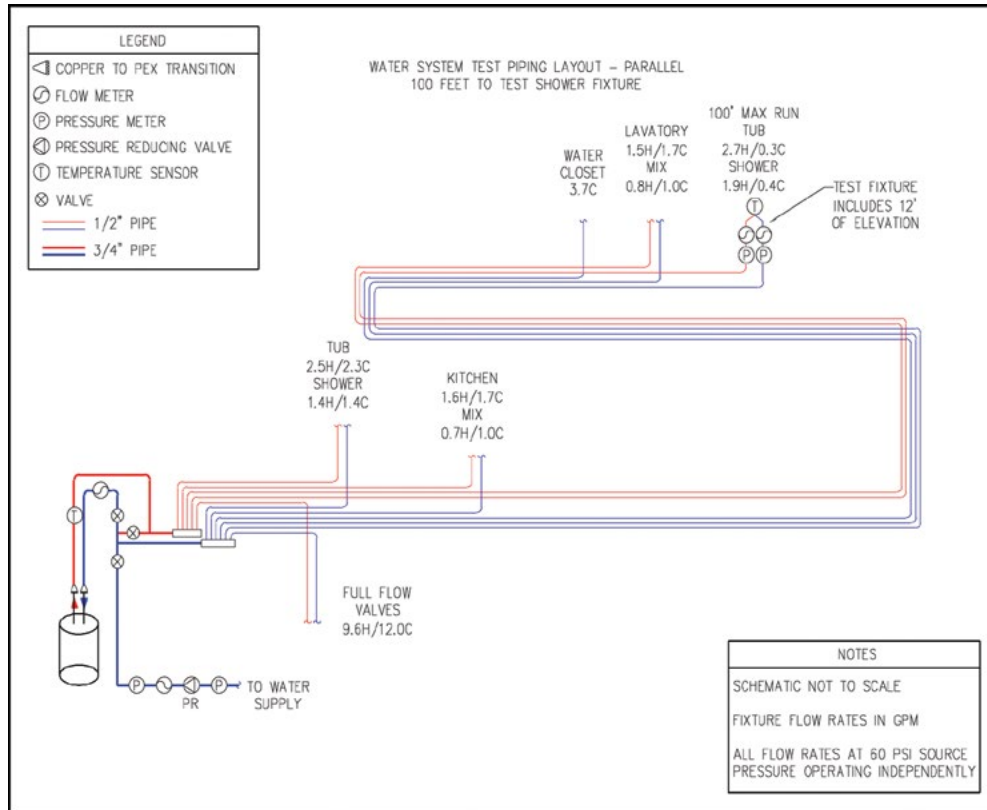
Water System Test Piping Layout – Parallel, 100' to TF
